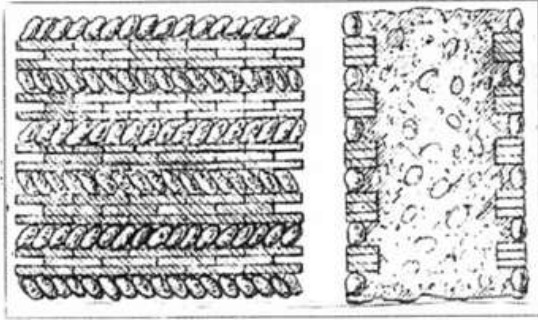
A profile of Sasanid bridge structure, which was used in constructing Dezful watermills in Dezful
